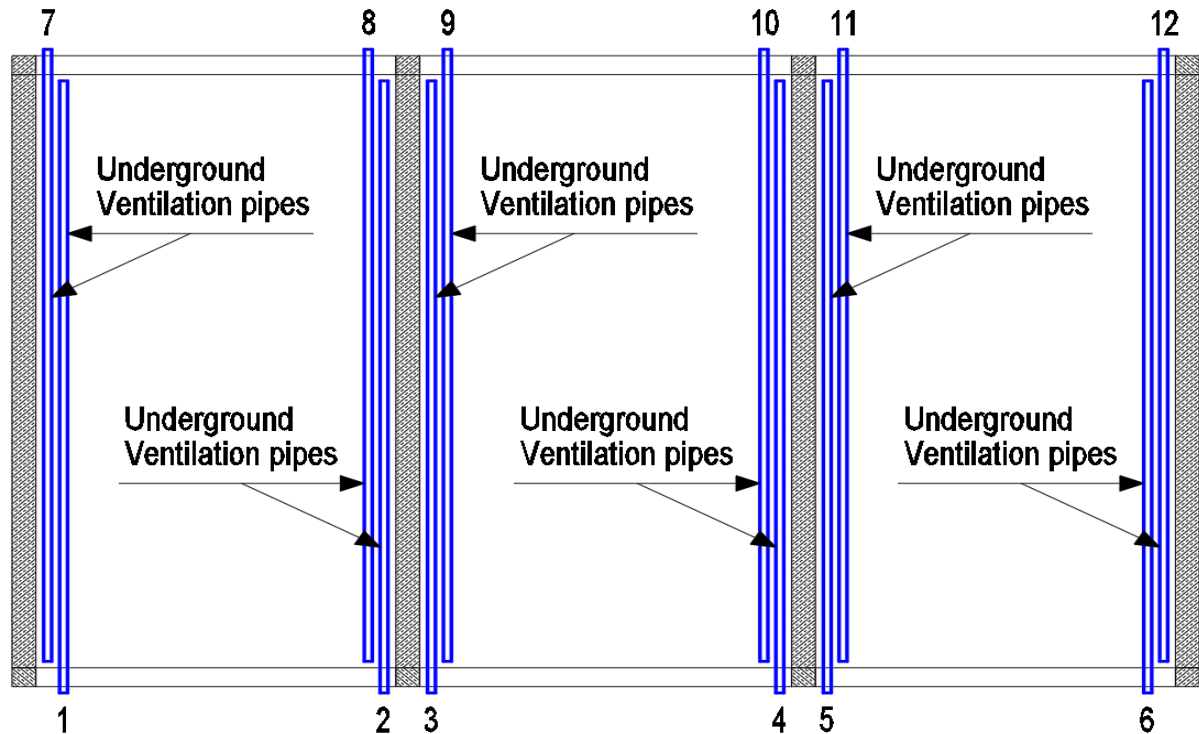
Laying plan of natural ventilation pipes with underground pipes.
